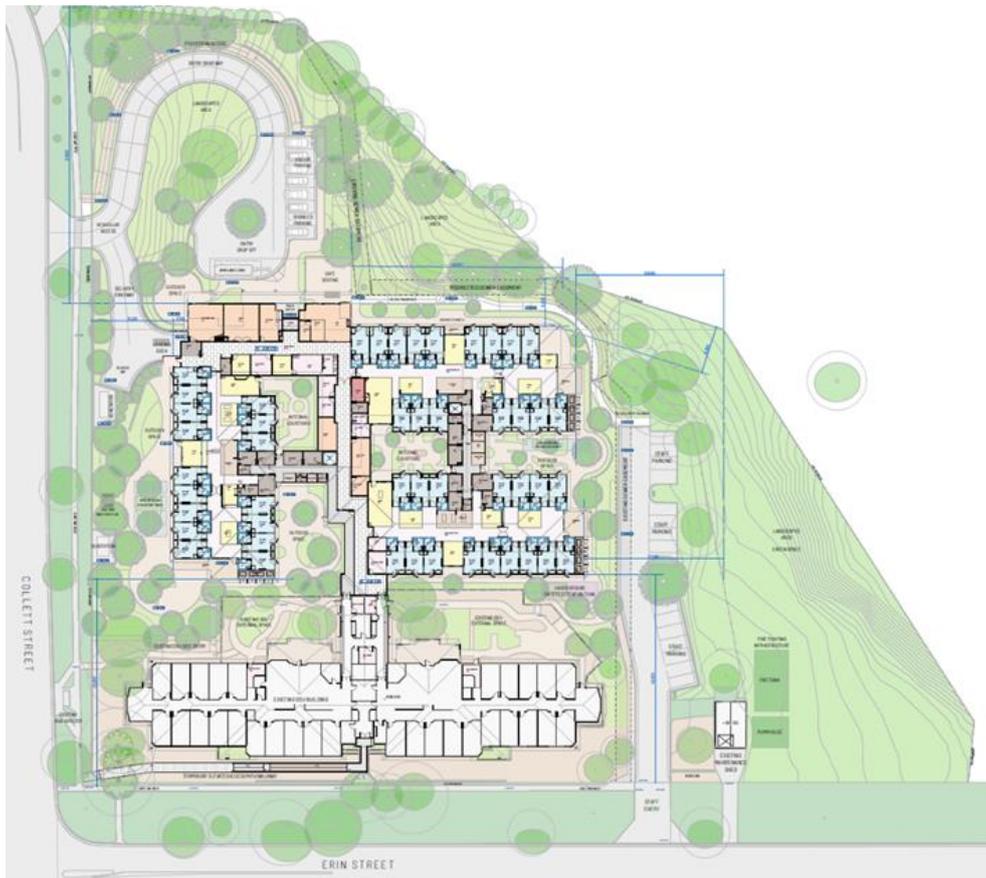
Proposed Ground Floor Arrangement and Internal Road Works
